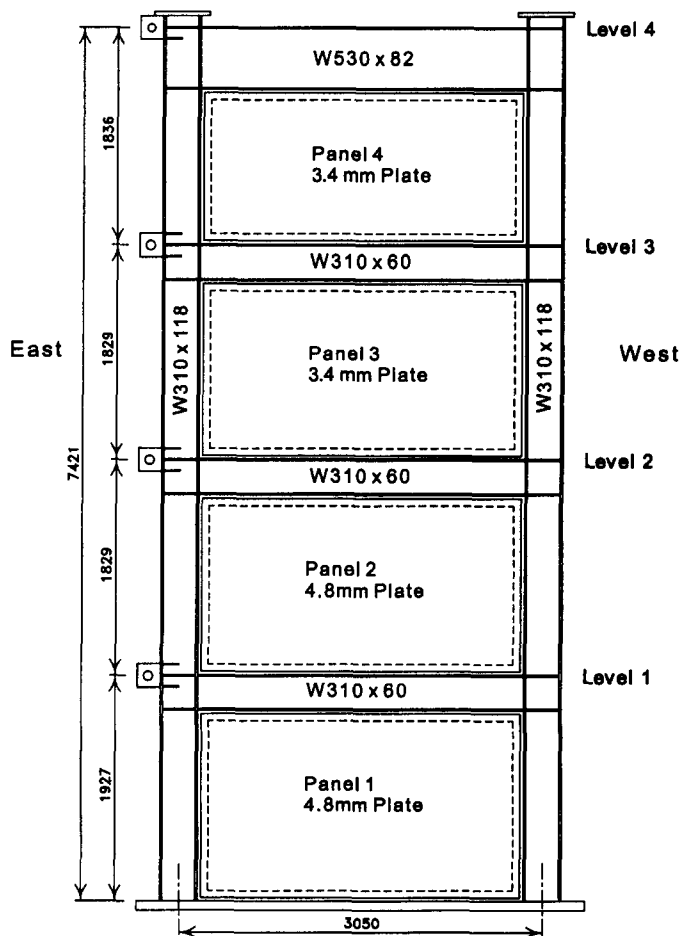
Steel Plate Shear Wall Test Specimen (North Elevation)
